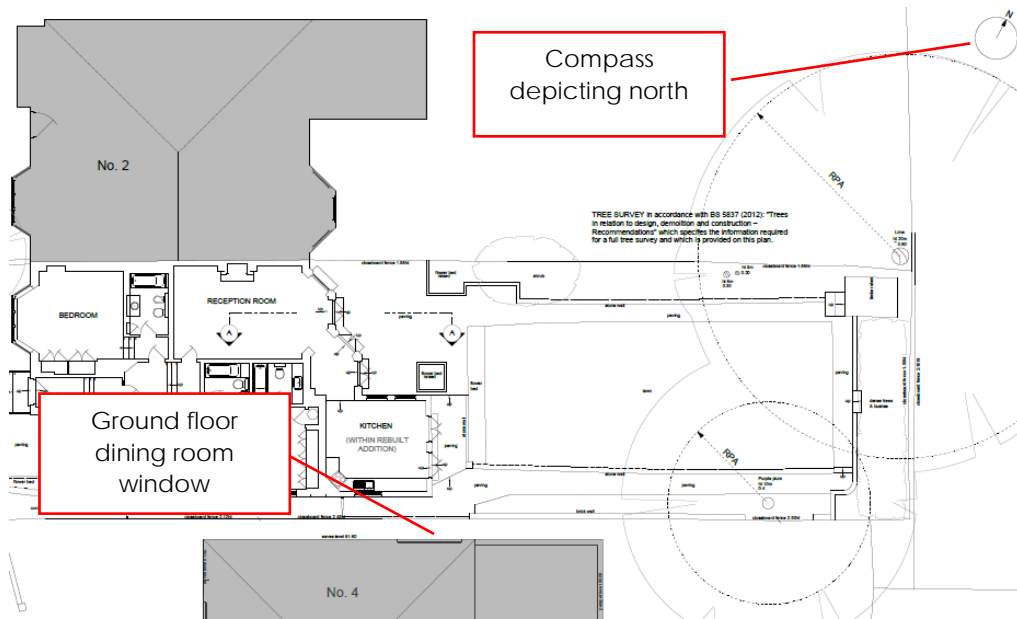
site plan demonstrating due north orientation of the flank windows within 4 Akenside Road
